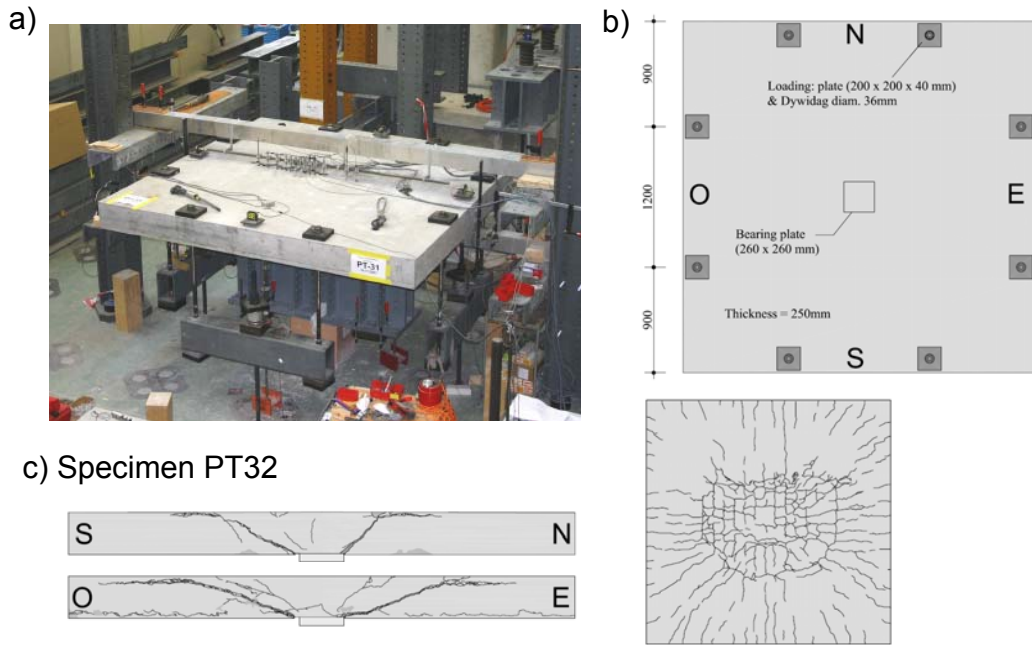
Punching shear test with different reinforcement ratios in both orthogonal directions (Muttoni et al.⁹): (a) test arrangement; (b) loading and general dimensions; and (c) crack pattern
